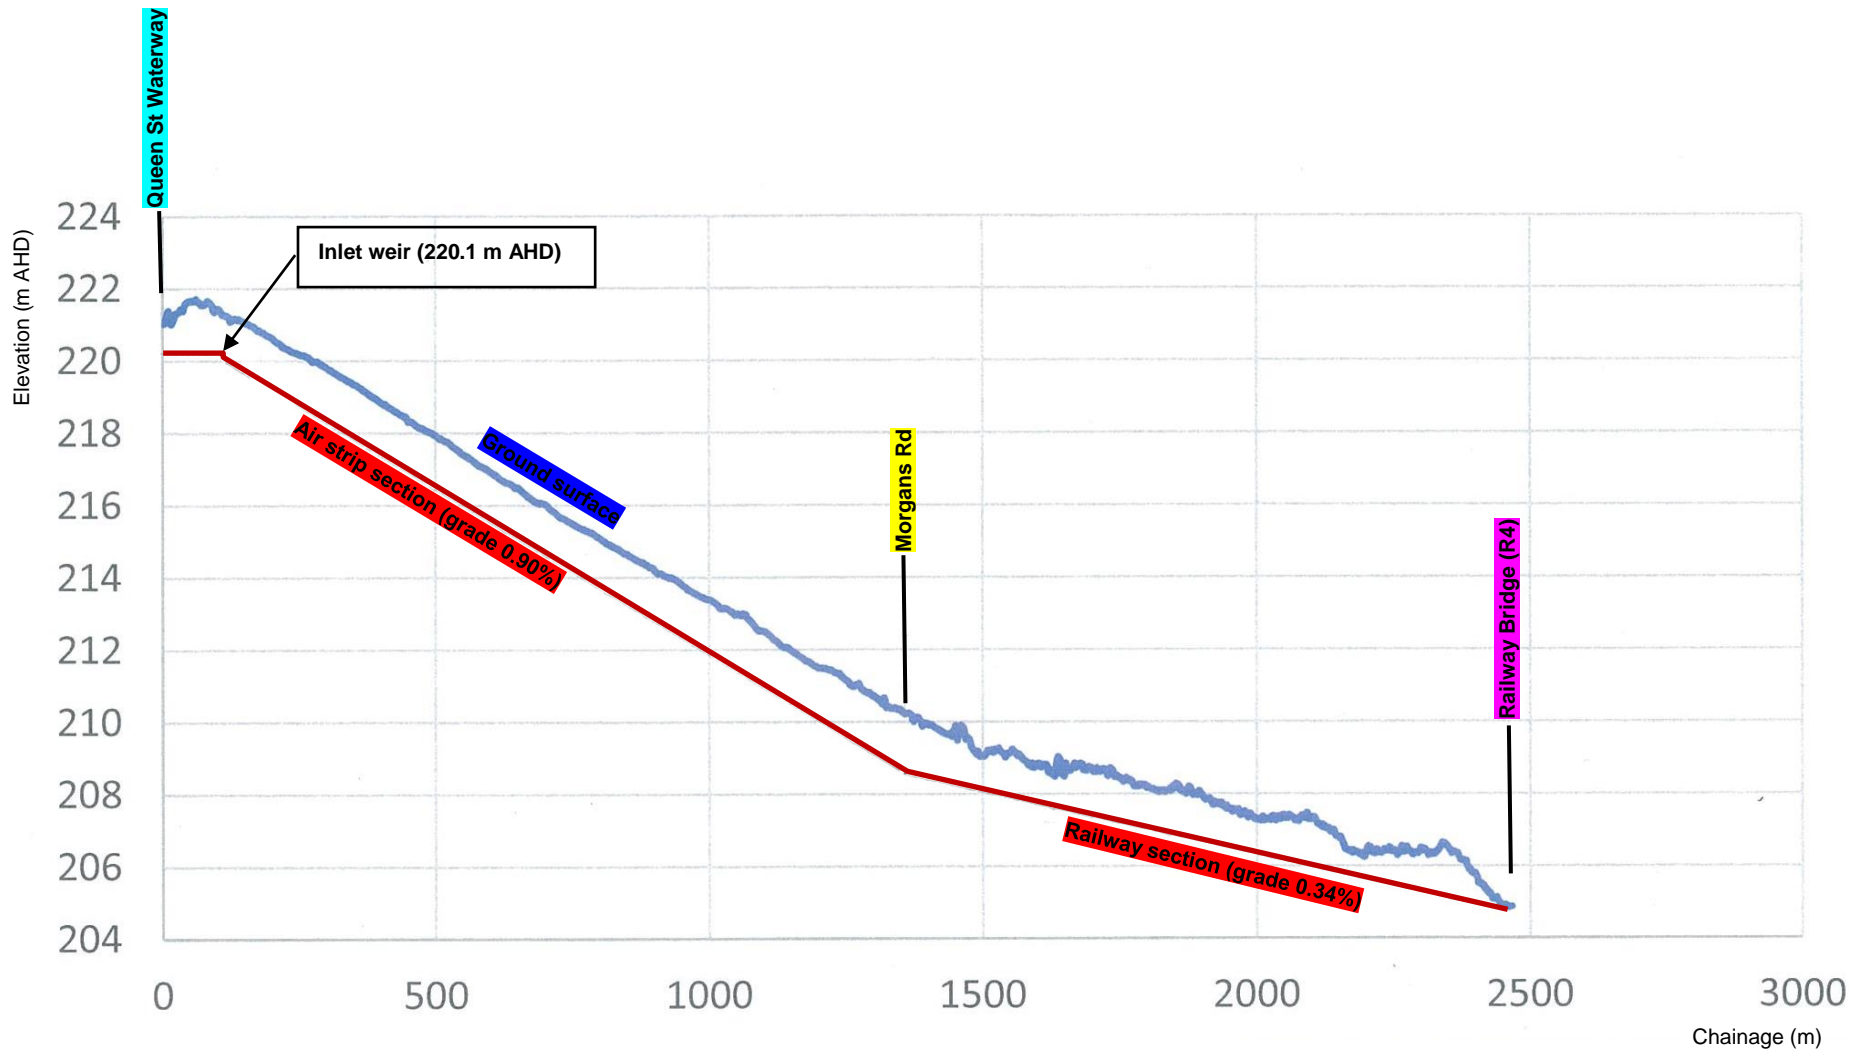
Queen Street Waterway Diversion Channel – Longitudinal Section
